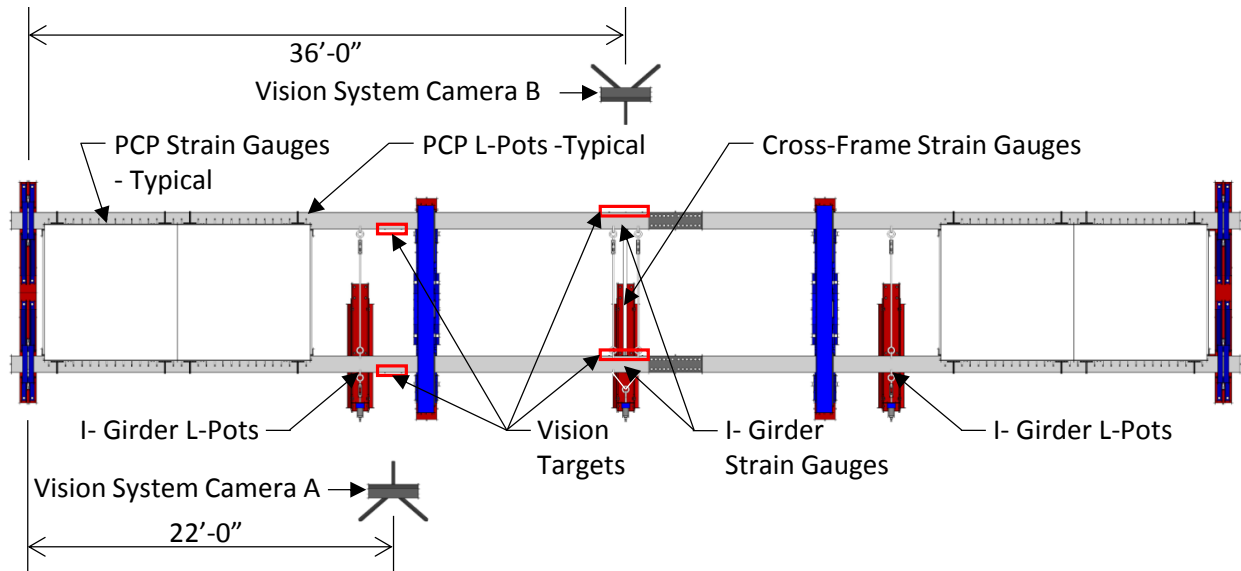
Instrumentation Plan for Simply Supported System – Plan View
